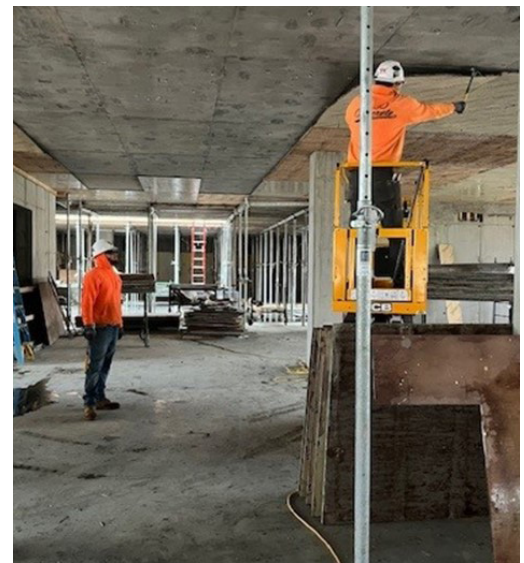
Workers remove deck formwork before installing reshores. (Image courtesy of Ceco Concrete Construction.)
